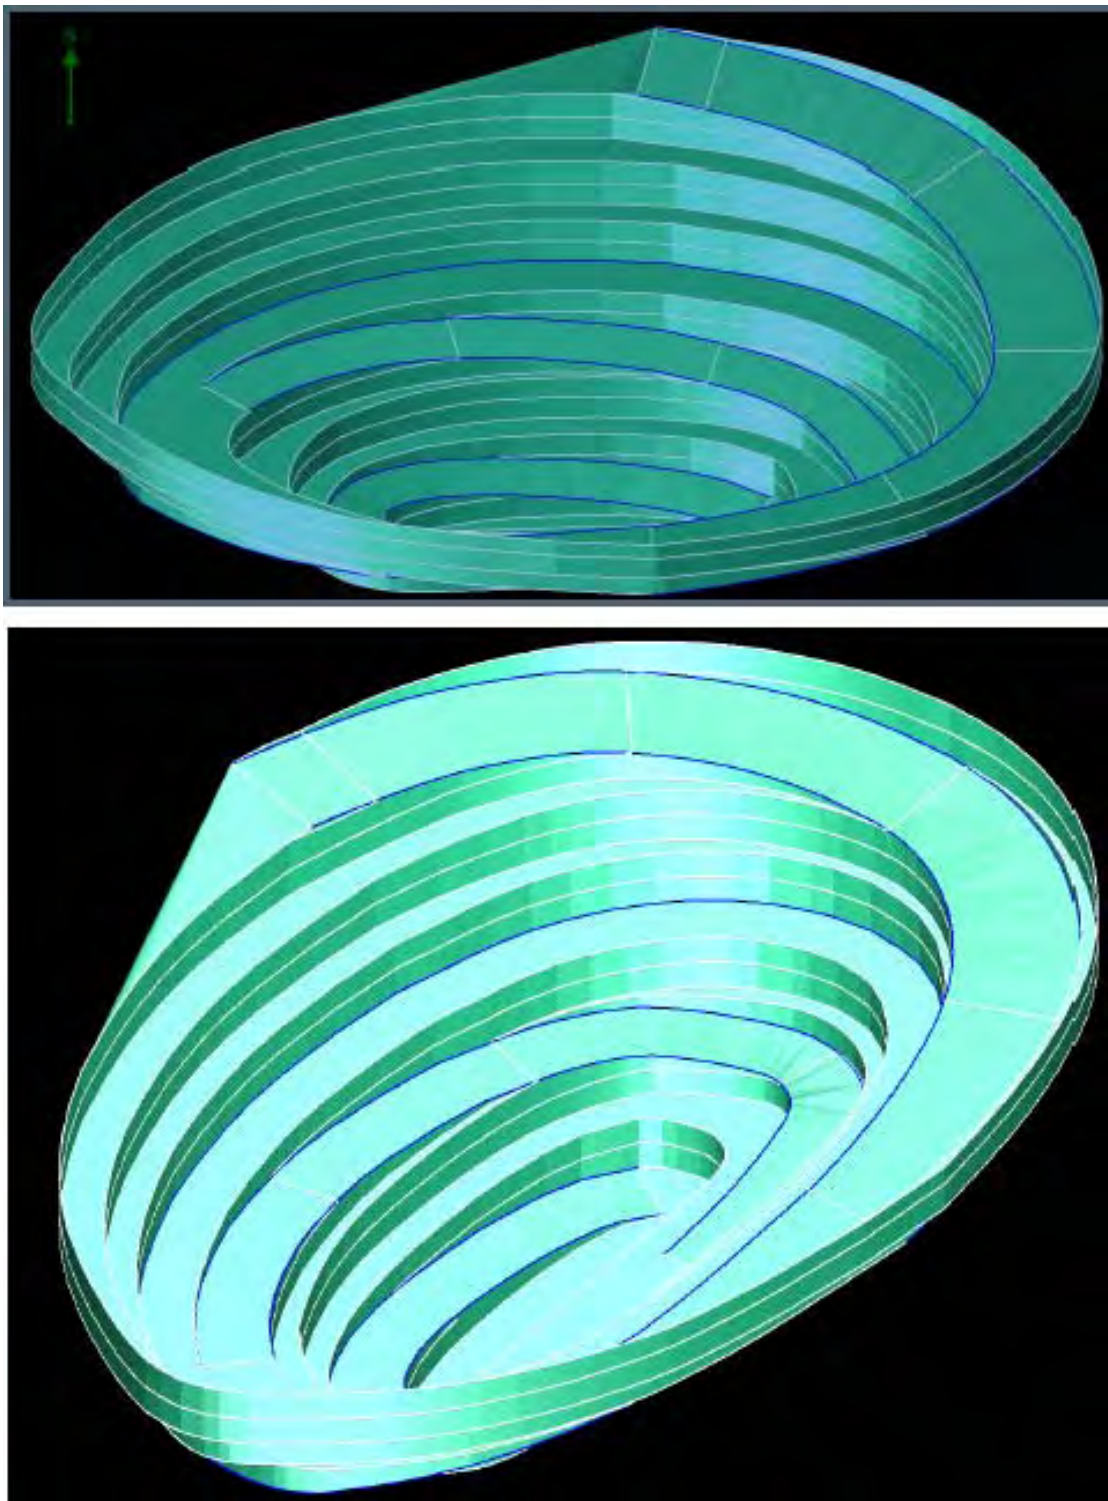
Proposed Lay-out of the Puimajuq Pit
